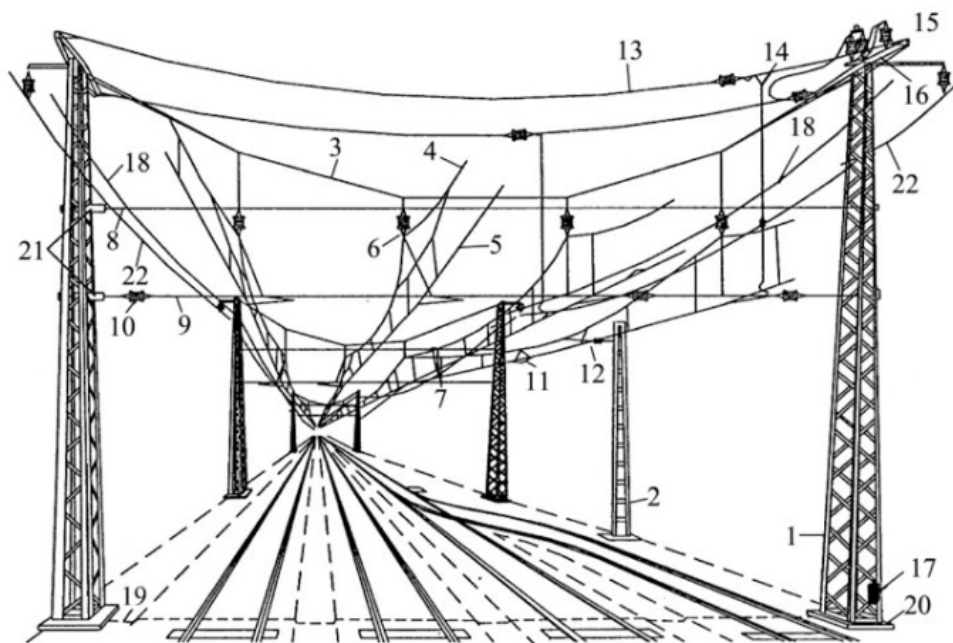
Head span of contact line. 1, Diagonal steel pole; 2, cross bar pole; 3, lateral messenger wire; 4, messenger wire; 5, contact wire; 6, suspension point; 7, electric connection; 8, upper safety rope; 9, lower safety rope; 10, insulator; 11, section insulator; 12, curve steady arm; 13 and 14, switch jumper; 15, isolating switch; 16, cross arm; 17, electric operating mechanism; 18, return wire; 19, pole grounding; 20, pole foundation; 21, safety rope compensation; 22, feeder.
